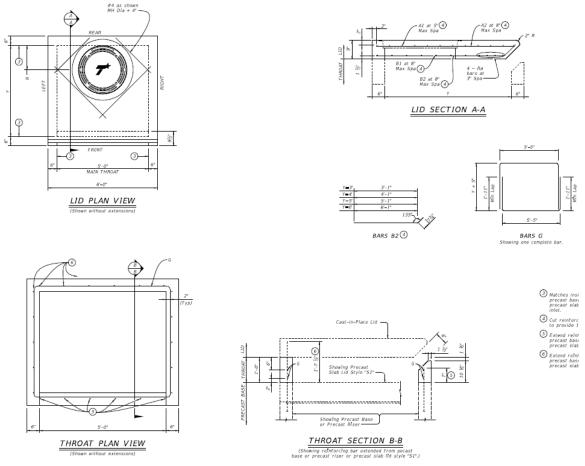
Example of Monolithic Inlet—TxDOT Cast-in-place Concrete Curb Inlet (8).
